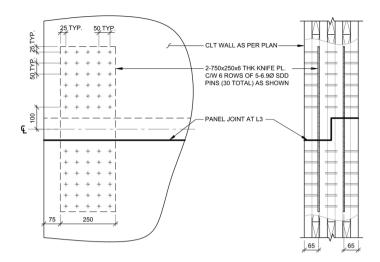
Capacity-protected connection between the CLT panel and the RSFJs
